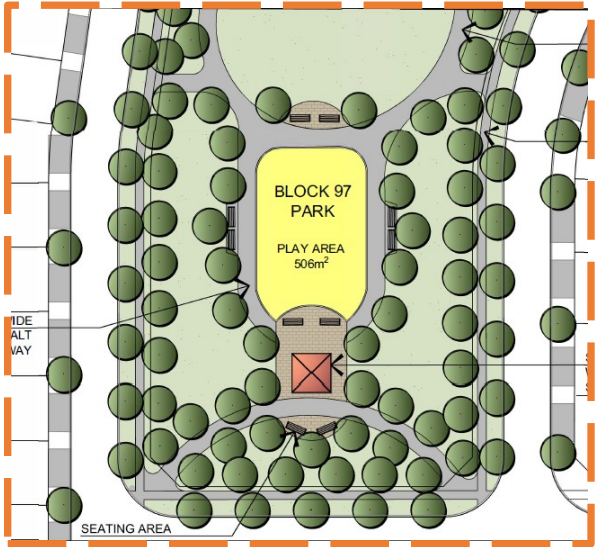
Related Draft Plan of Subdivision Application (19T-220V13) – Edenbrook (Weston) Inc.
